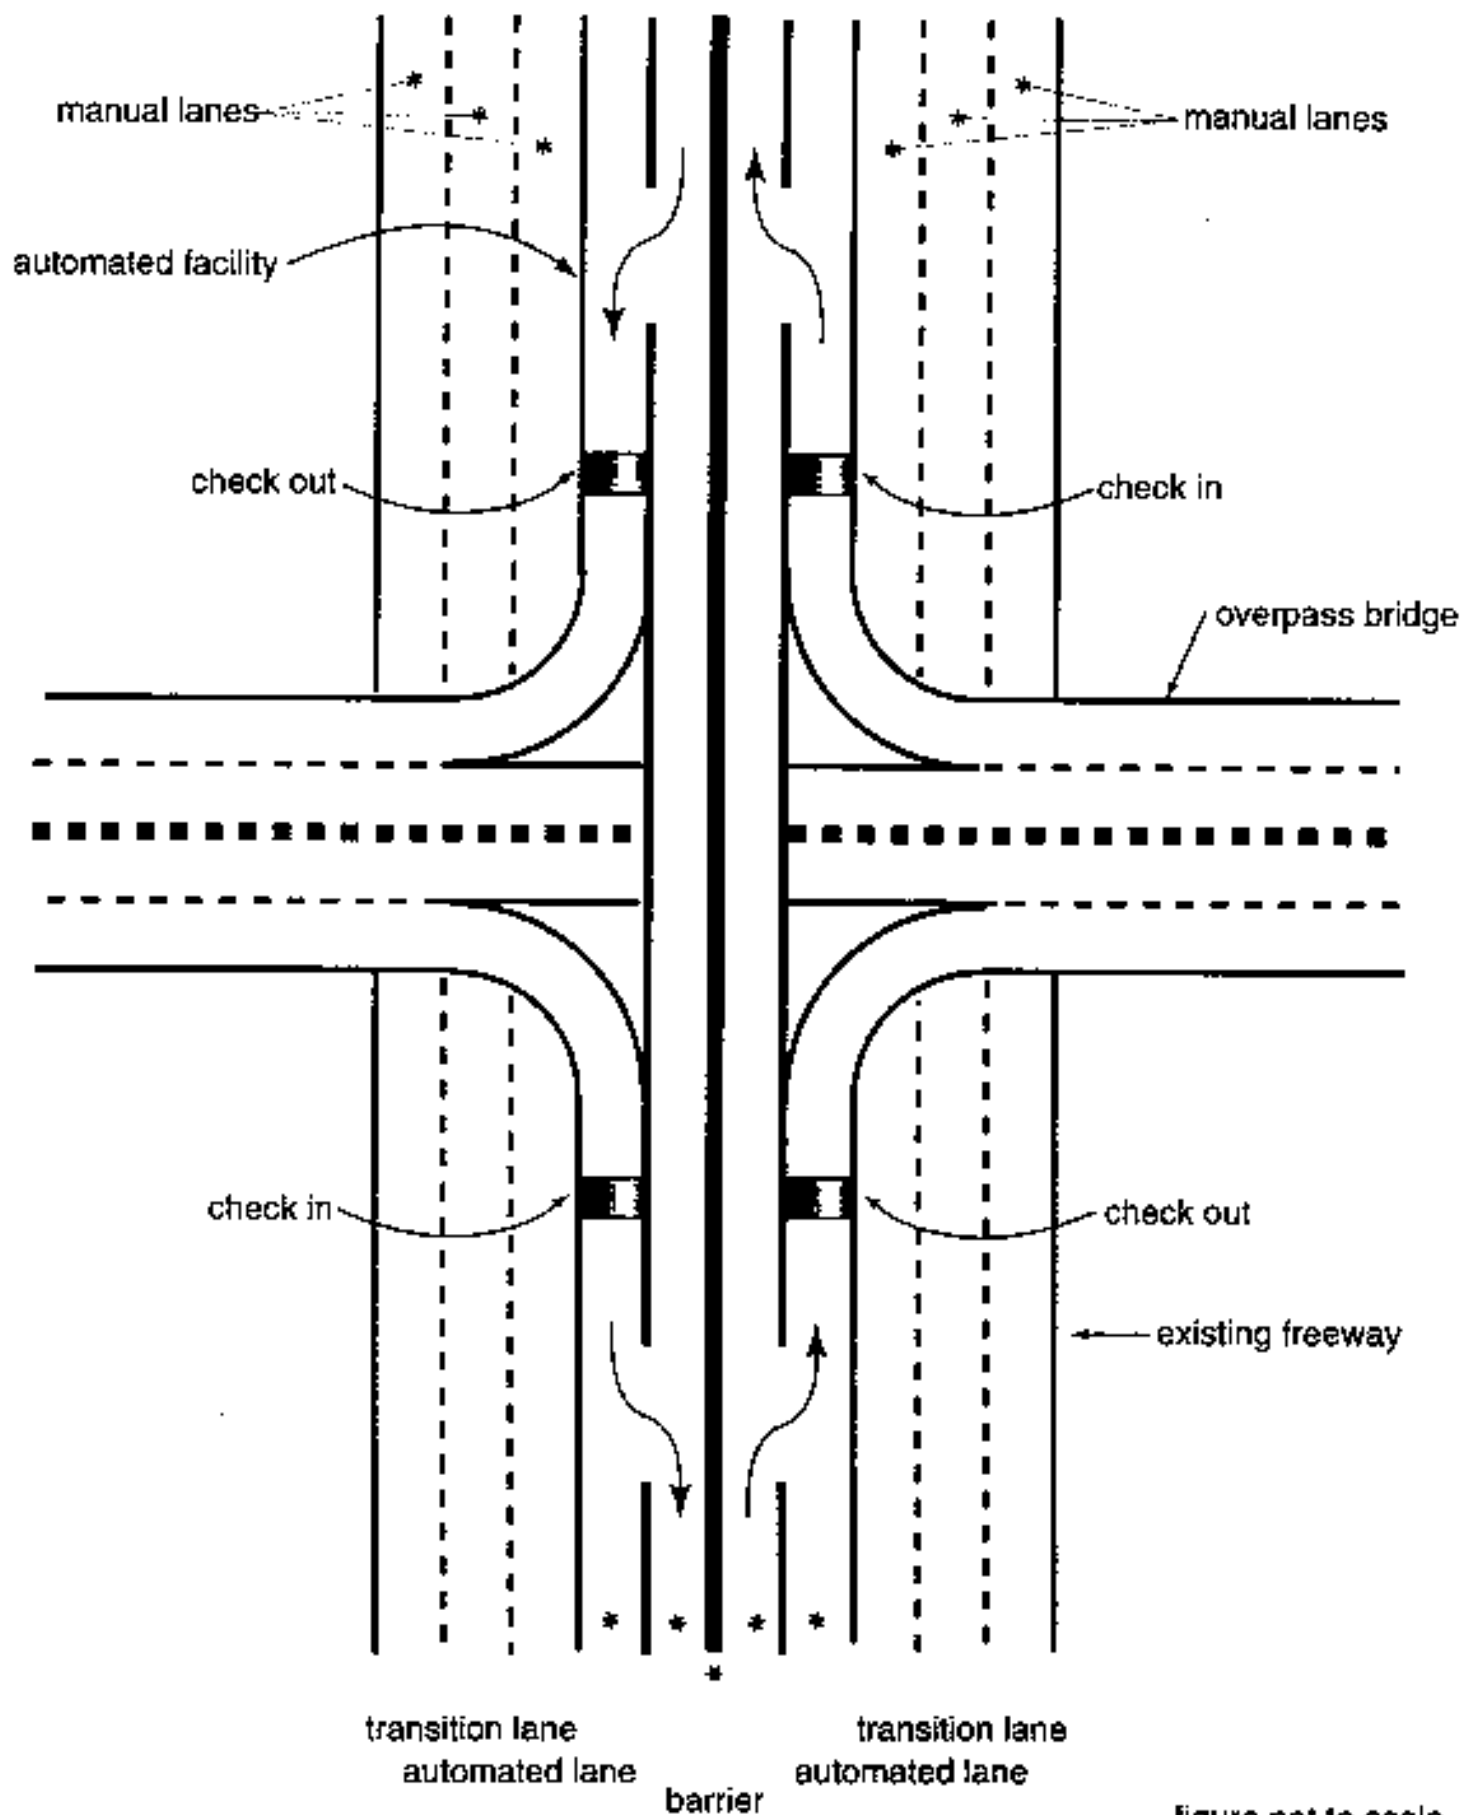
Dedicated Entry & Exit Concept for Elevated AHS
